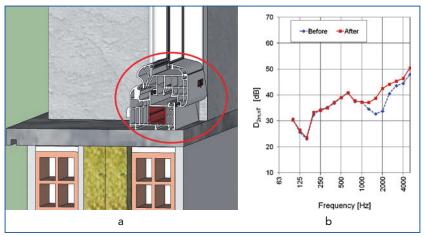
a) Example of acoustic break on the windowsill, b) Façade insulation before and after the window adjustment.
